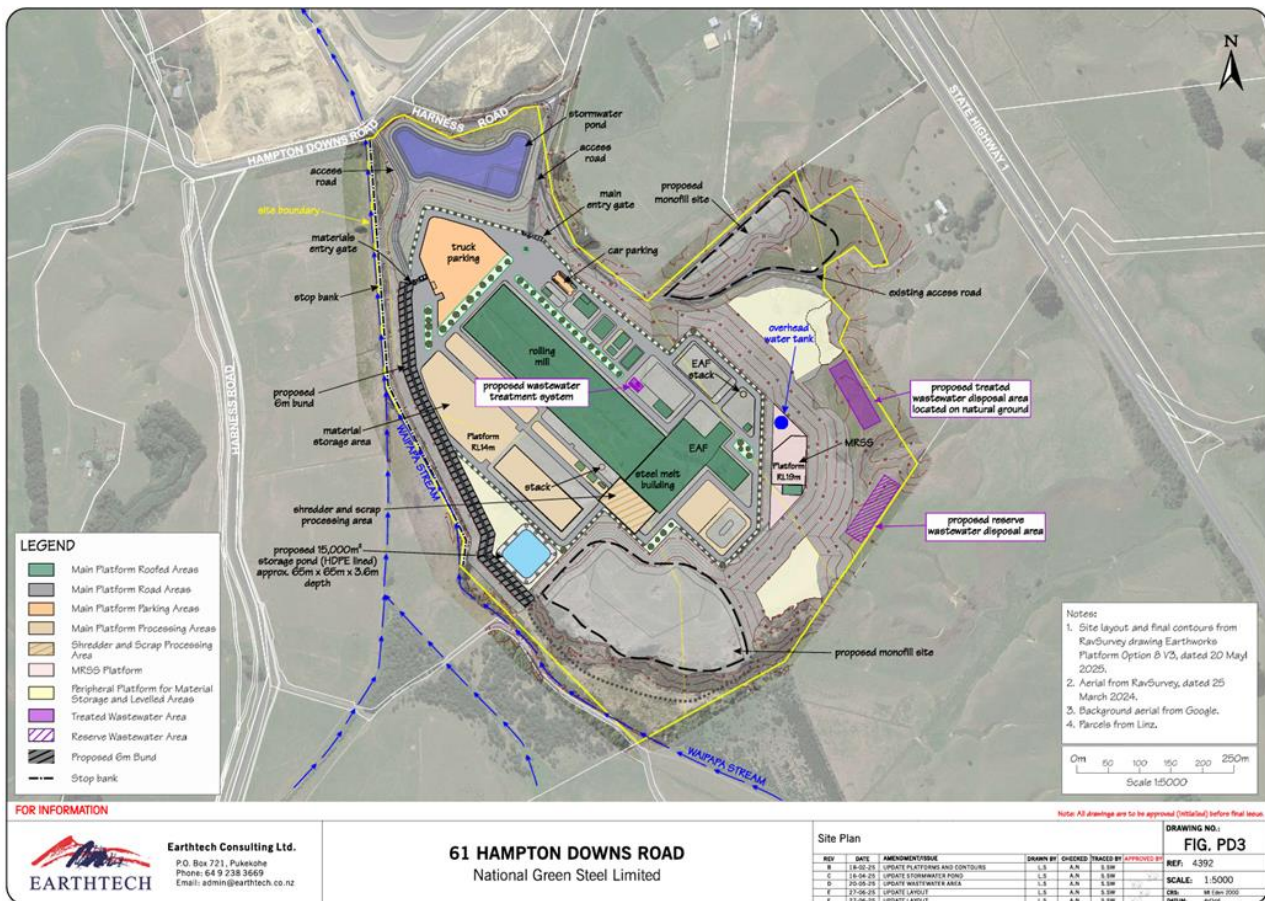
3D Green Steel Site Plan (see Attachment 6 for an A3 version of the plan)
